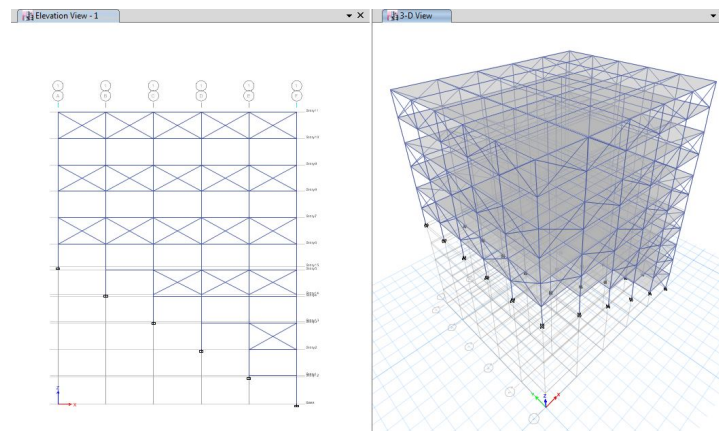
Elevation and 3D View of braced Building Model at 30 degree angle of sloping
